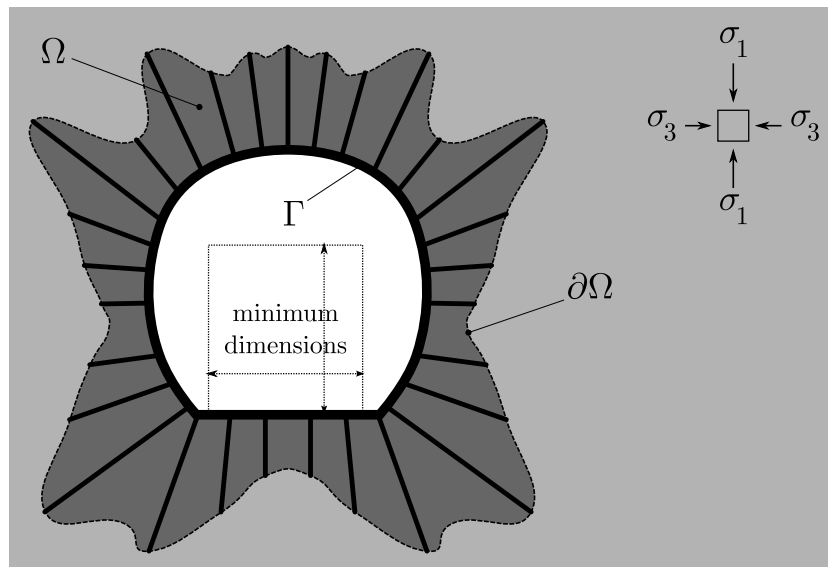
A simple design case of an underground tunnel with reinforcement.
